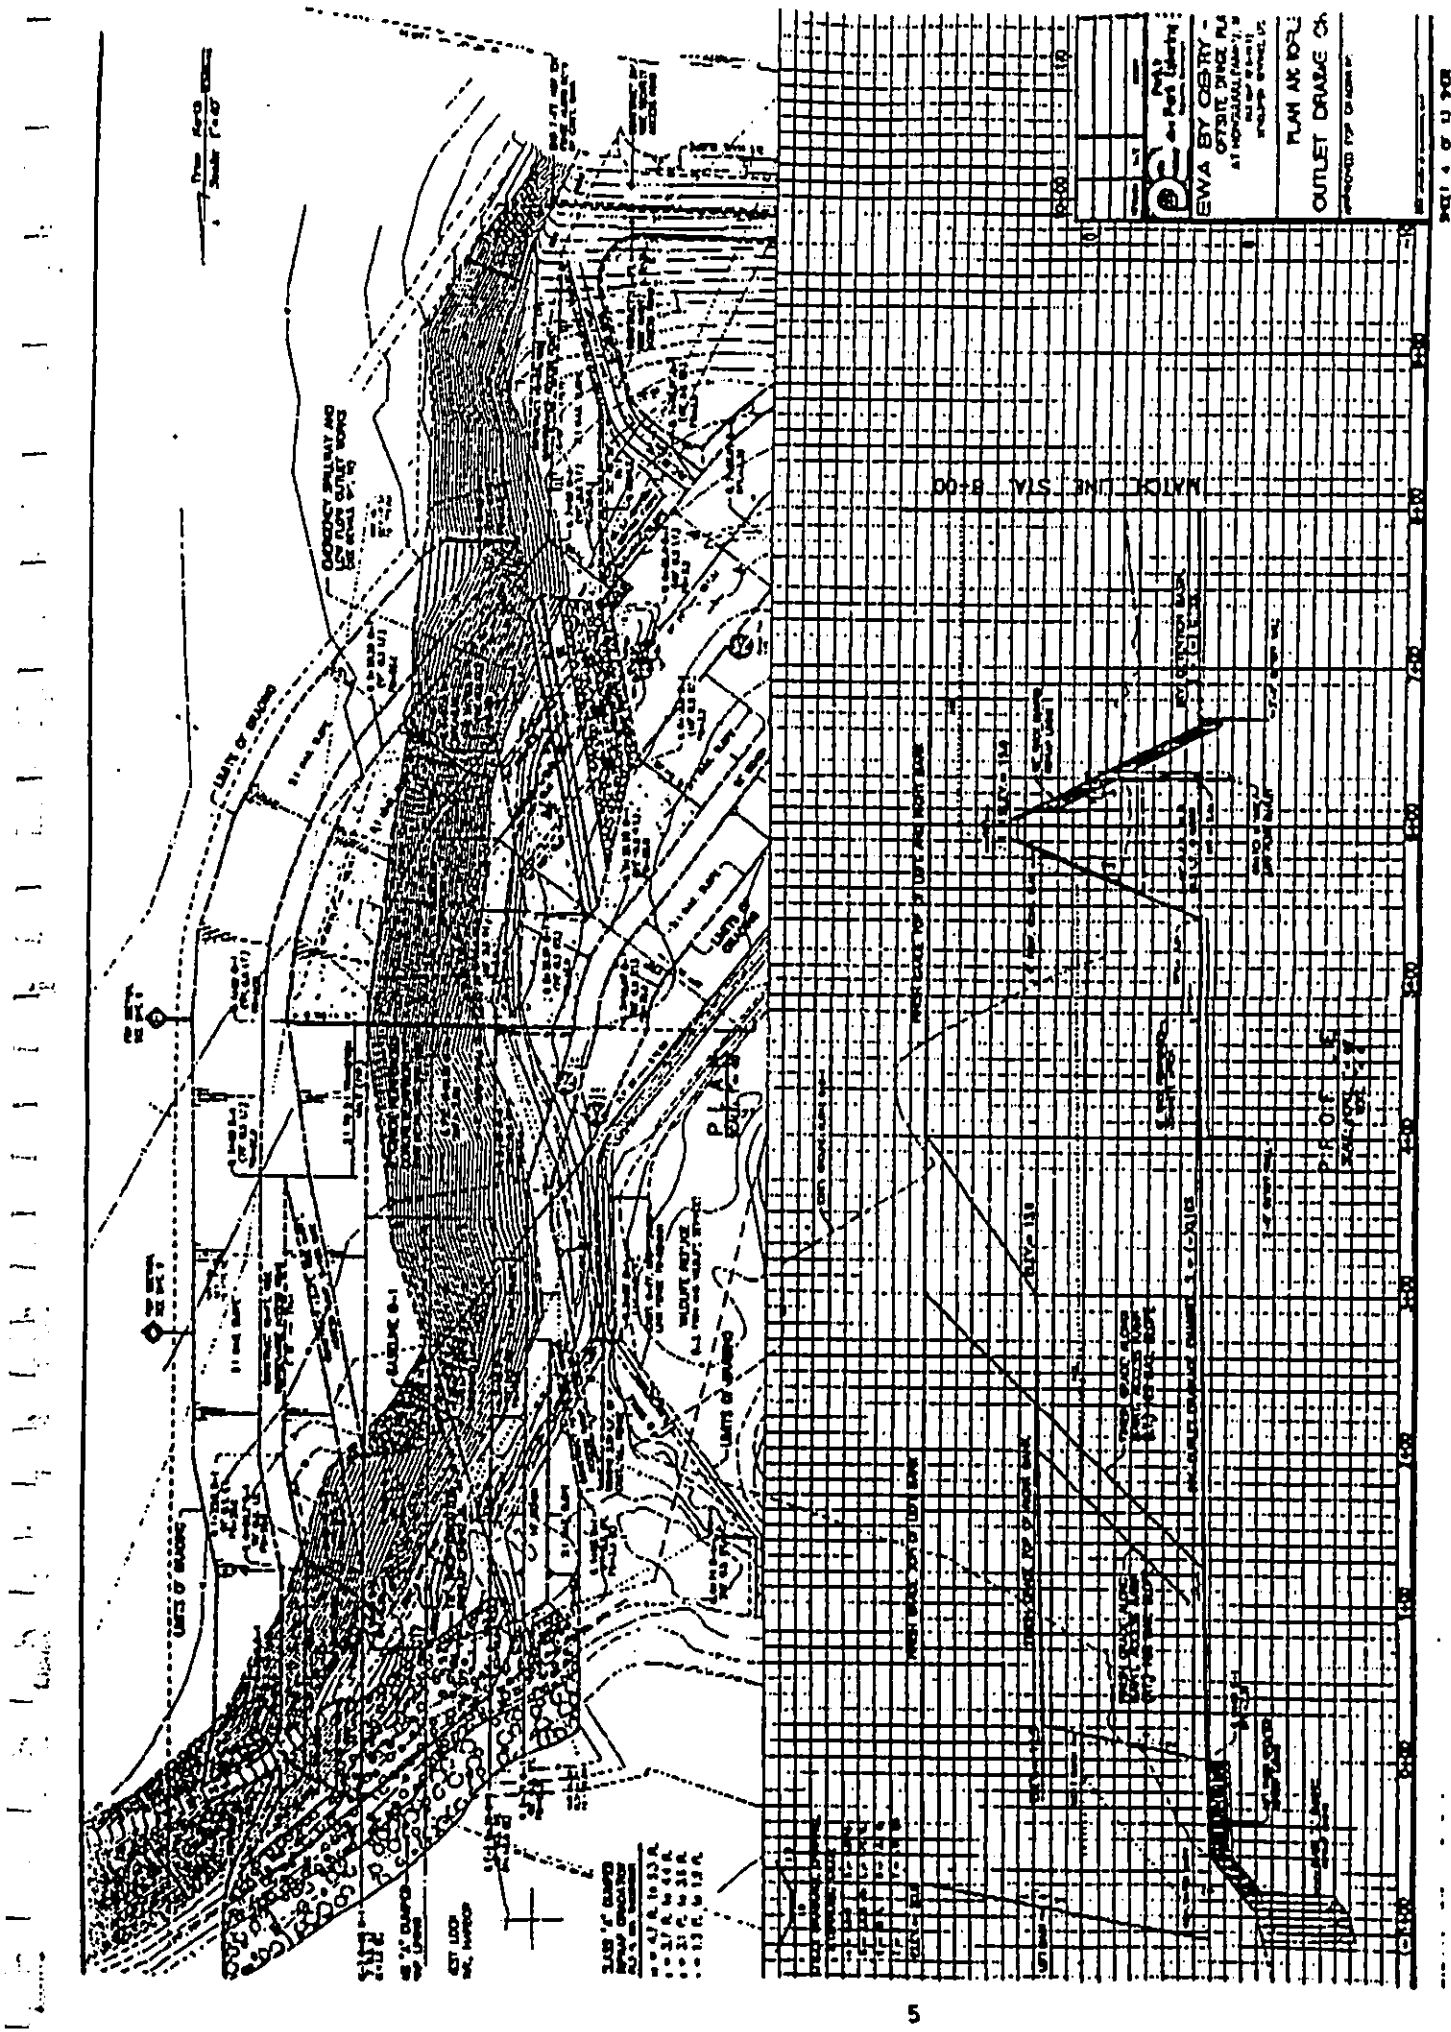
Plan and Profile of Outlet Drainage Channel (Park Engineering).
